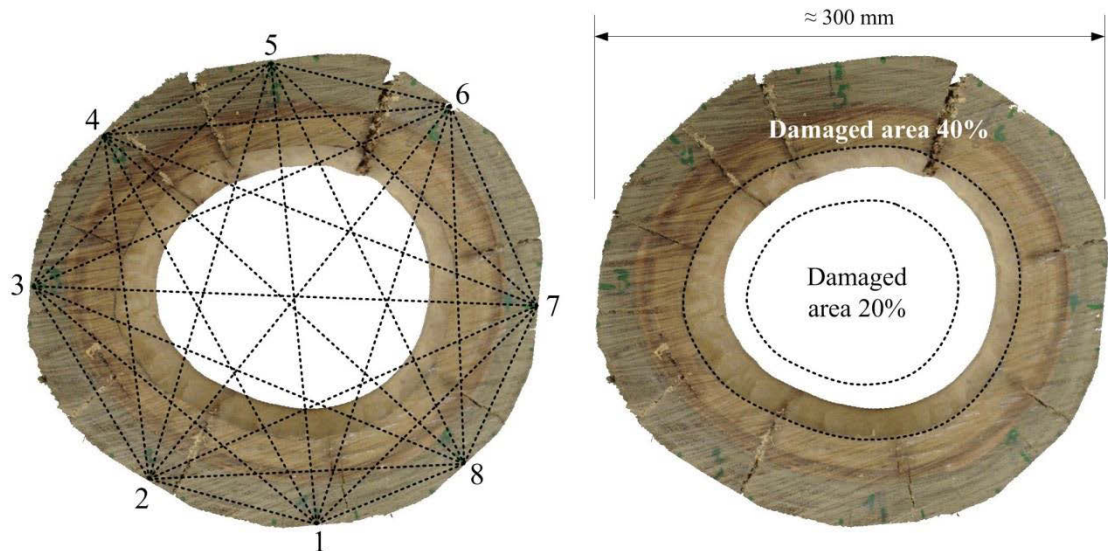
Cross-sectional pole section specimen used for transversal damage detection
